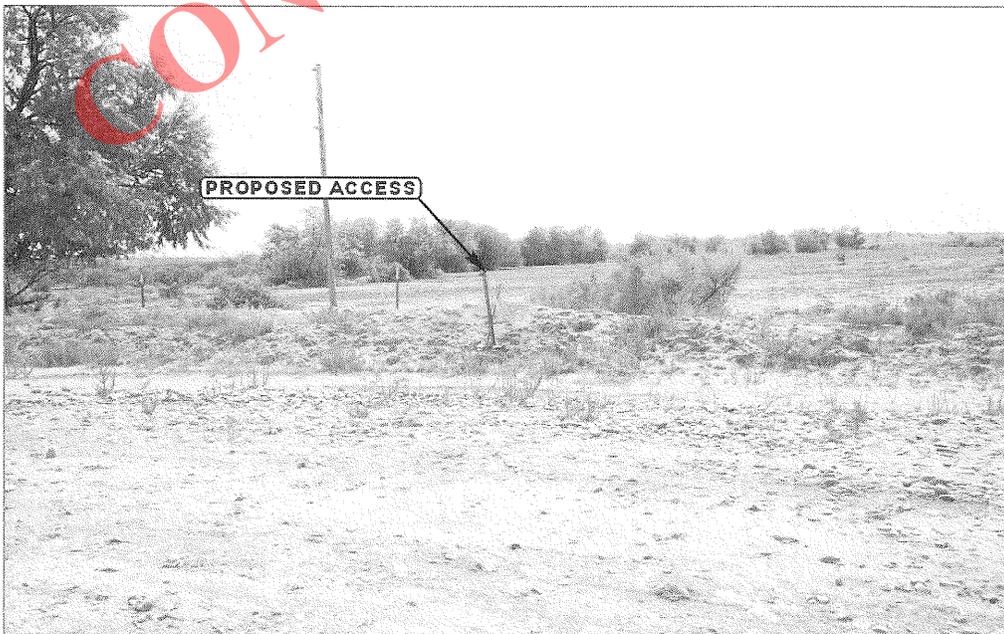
PHOTO: VIEW FROM BEGINNING OF PROPOSED ACCESS
